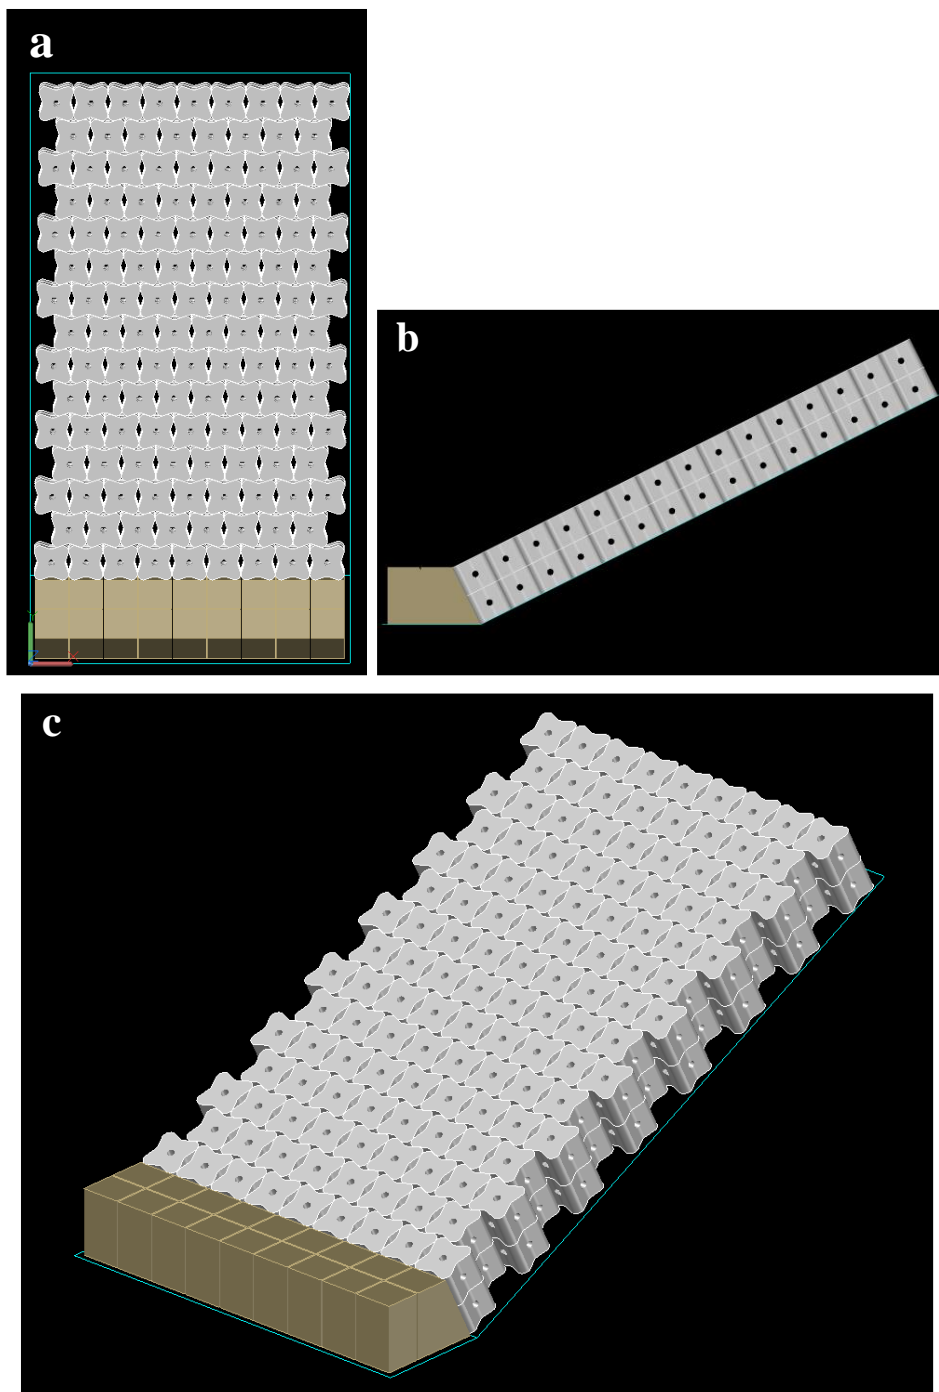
Schematic layout for the proposed armour units: a) plan view; b) side view; c) perspective view.
